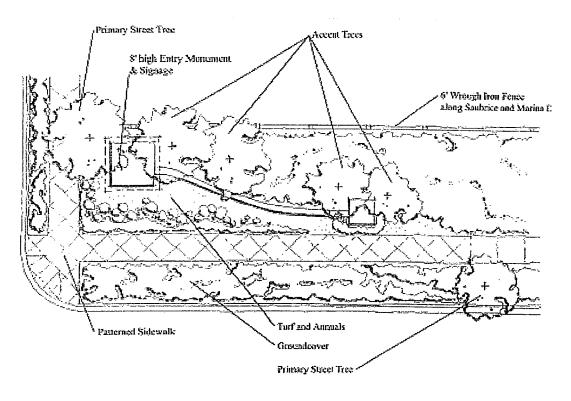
A NEIGHBORHOOD ENTRY PLAN
